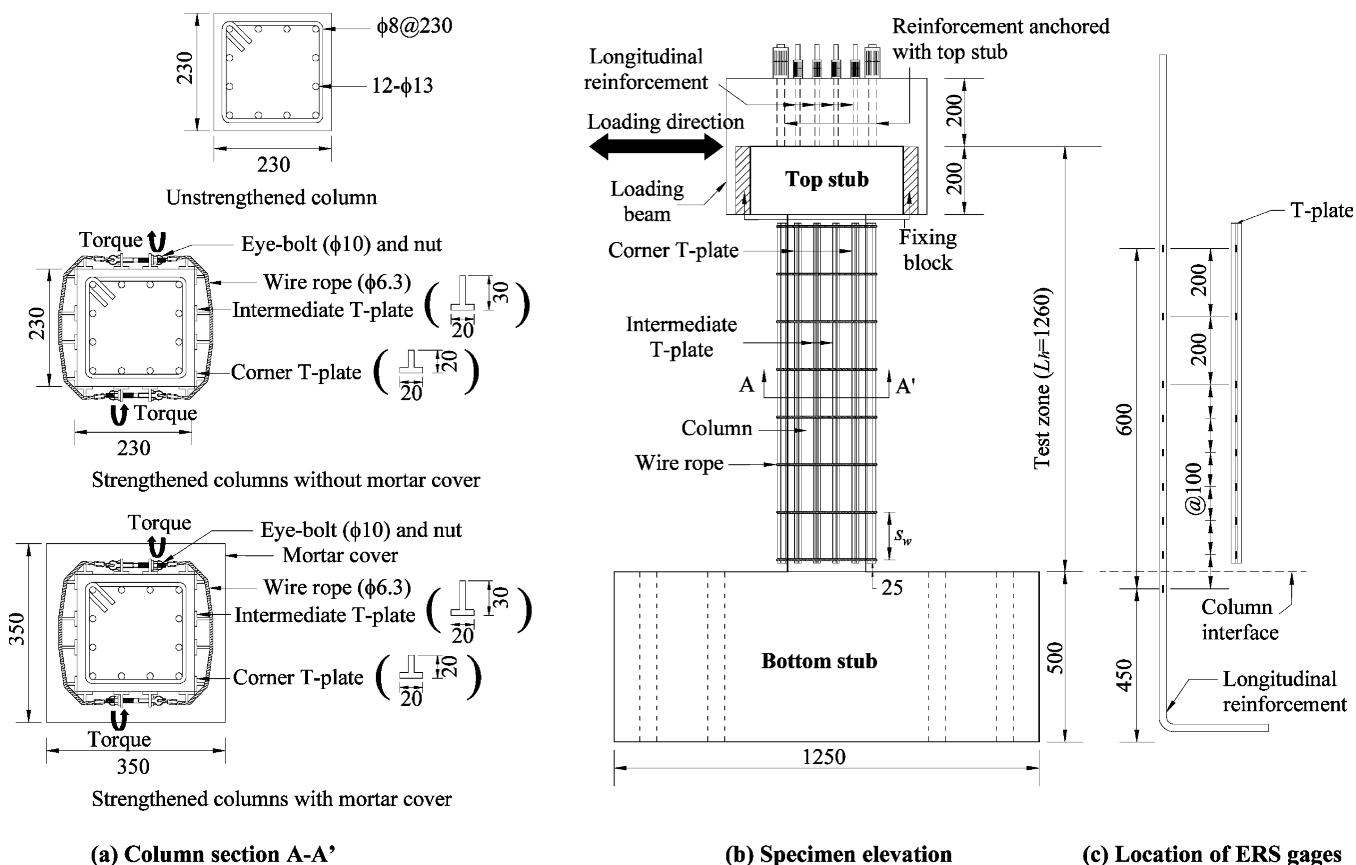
Specimen details and arrangement of wire rope and T-plate units. (Note: all dimensions in mm; 1 mm = 0.0394 in.)
